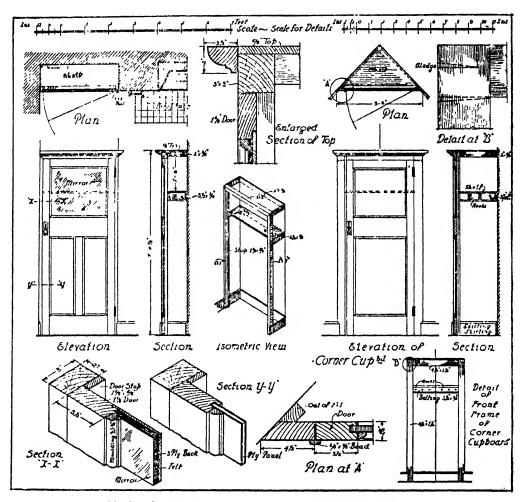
Fig. B.—Constructional Details of Corner and Recessed Cupboards.
